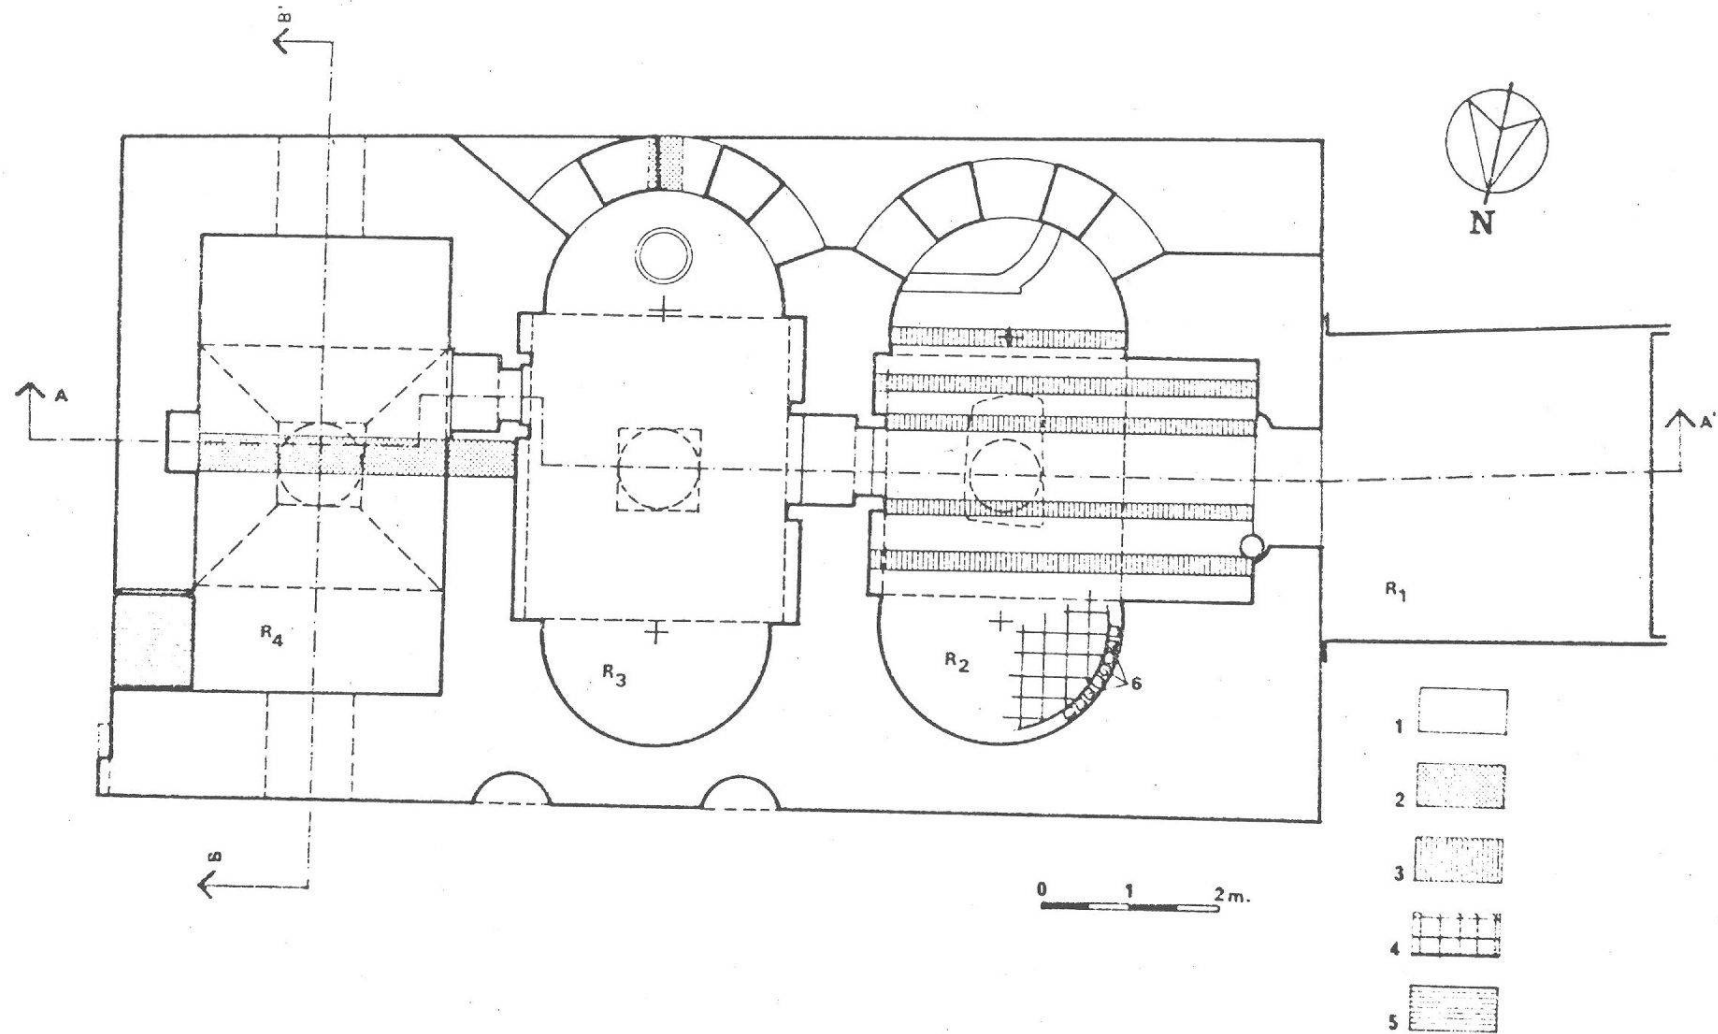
Emmaus. Ground plan of the *thermae*: (1) Original walls with Islamic-period additions; (2) Channel; (3) *Suspensurae*; (4) Floor of pottery tiles; (5) Blocked doorway; (6) *Tubi*.
